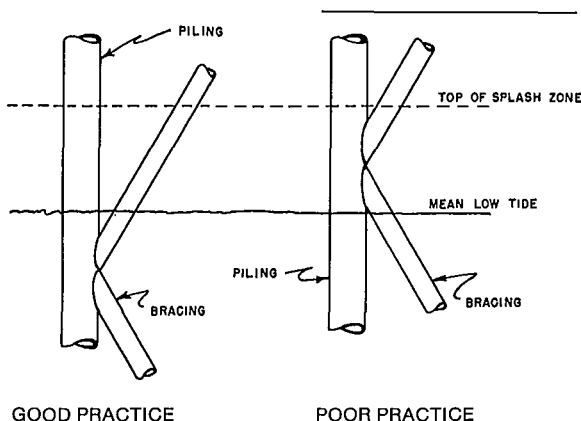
Welded Joints and Intersections of Bracing Should Be Either Above or Below the Splash Area
